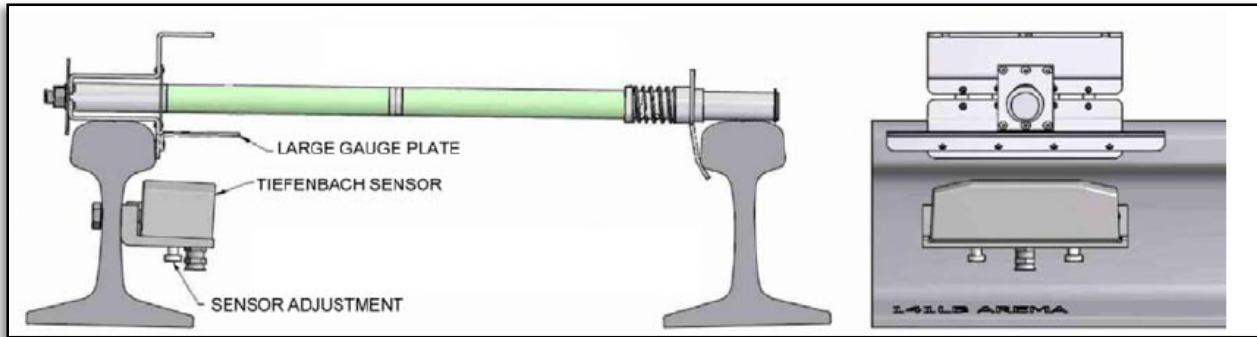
2600-800 Wheel Sensor Gauge Placement
